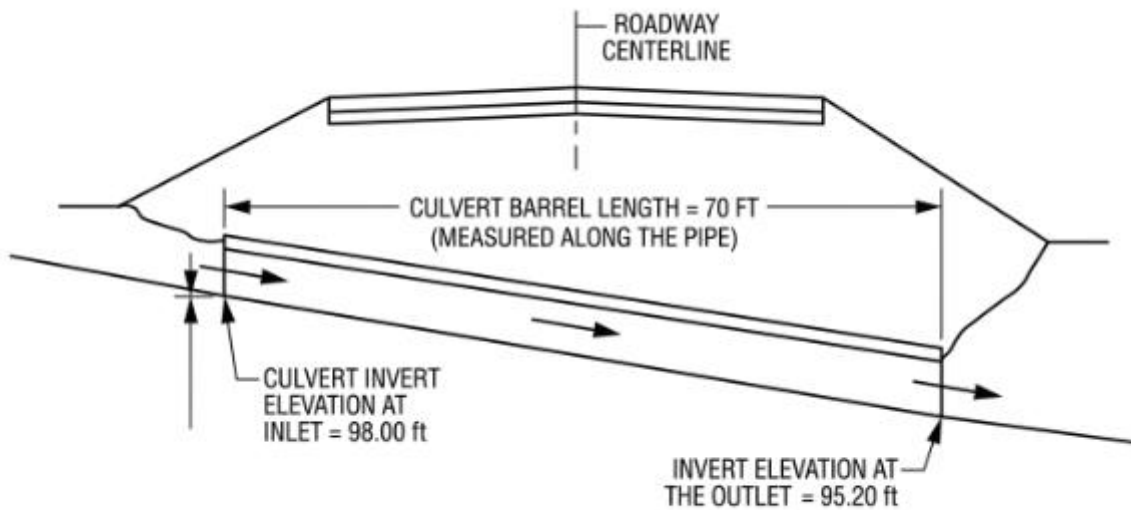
Longitudinal profile diagram of a culvert crossing beneath a roadway embankment.
